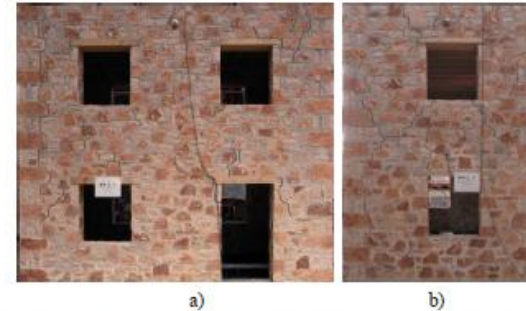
As built specimen. Observed damages at a) the long wall 1 (LW1) and b) the short wall 1 (SW2); at 90% of Kalamata earthquake
